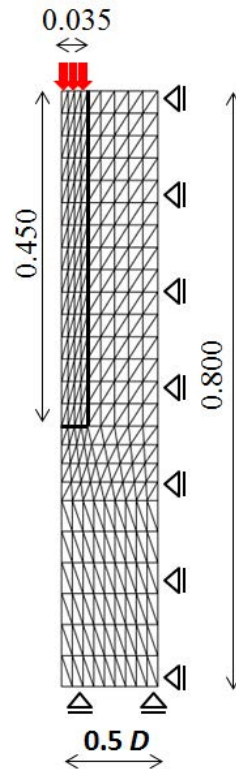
Finite element mesh and boundary conditions used in numerical modelling of a static test of the SM column working in a group installed in loose sand (all dimensions in meters)
